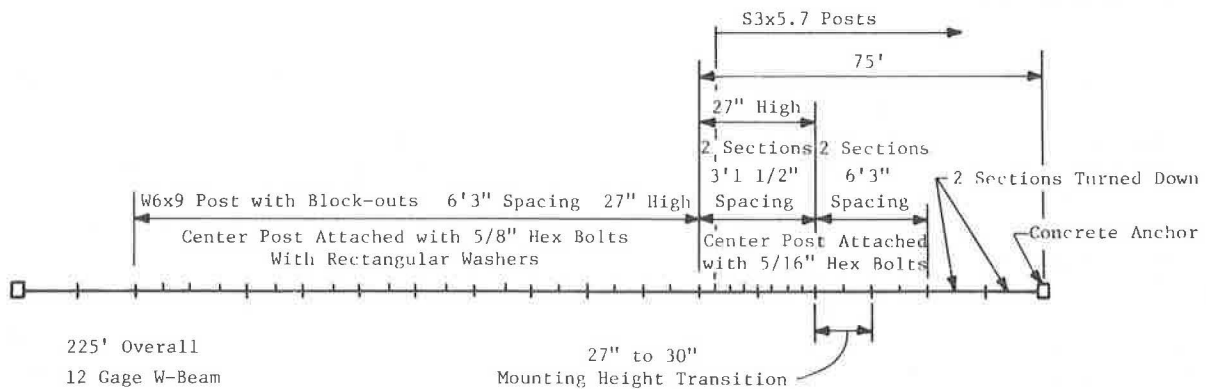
Plan view of barrier used for Tests 108 and 109.
